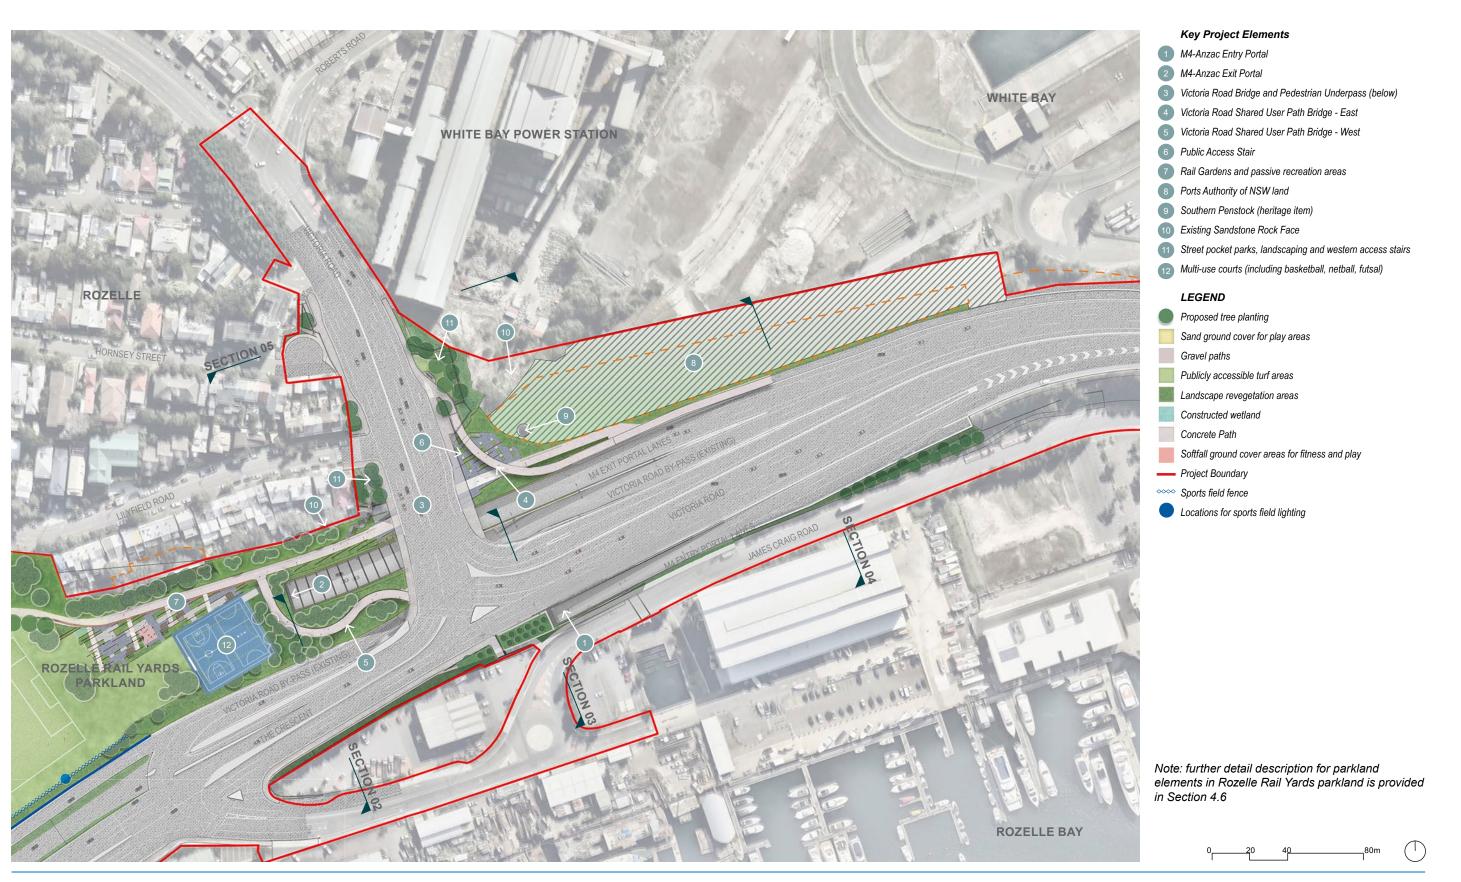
Rozelle - Concept Plan - Drawing 3 of 4
